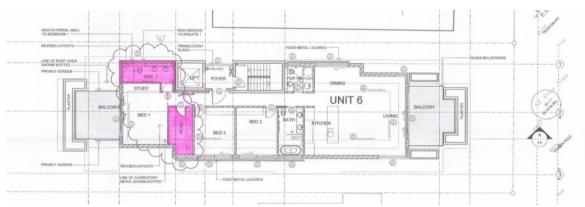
Approved floor plan (DA/743/2006/C) - 112-114 Beach St, Coogee (Source: Ergo Architecture)
